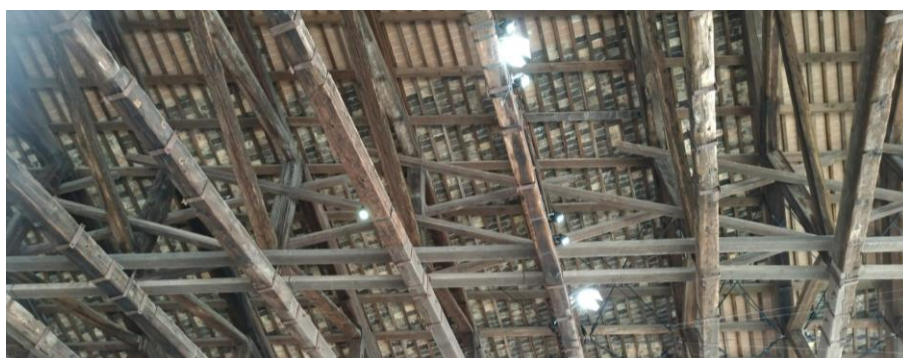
Detail of the transverse bracing system of the Gaggiandre roof.
